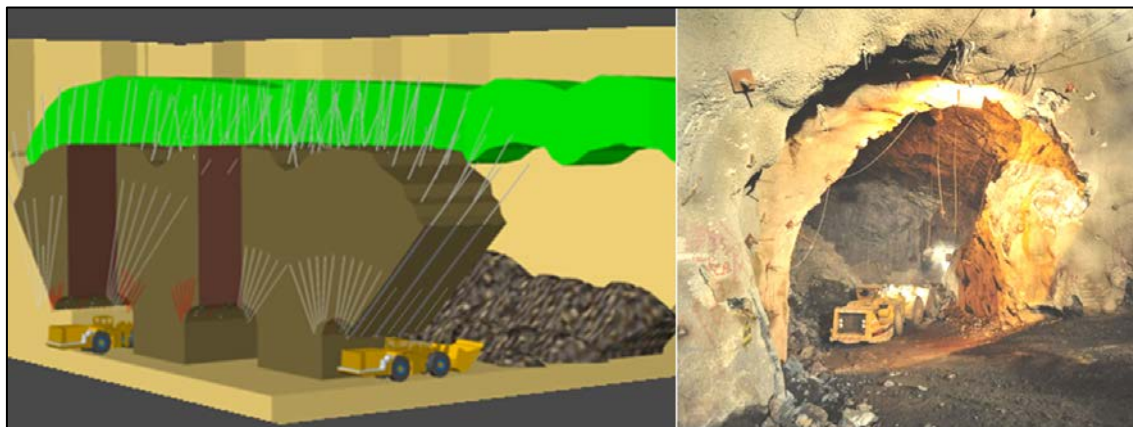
Open Stope roof camber degree defined by fandrill research section.
